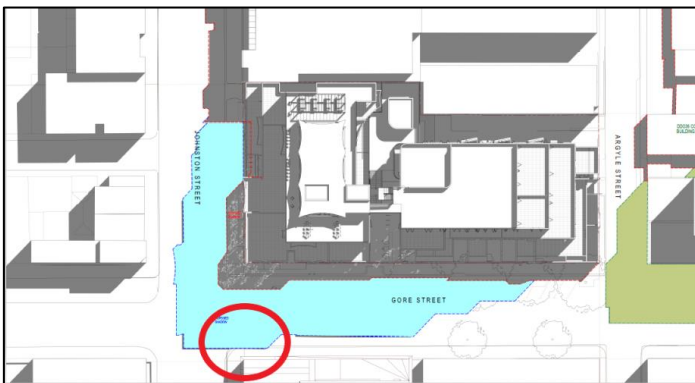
(Shadows to the Gore Street Footpath, SJB Architects September 2021)
